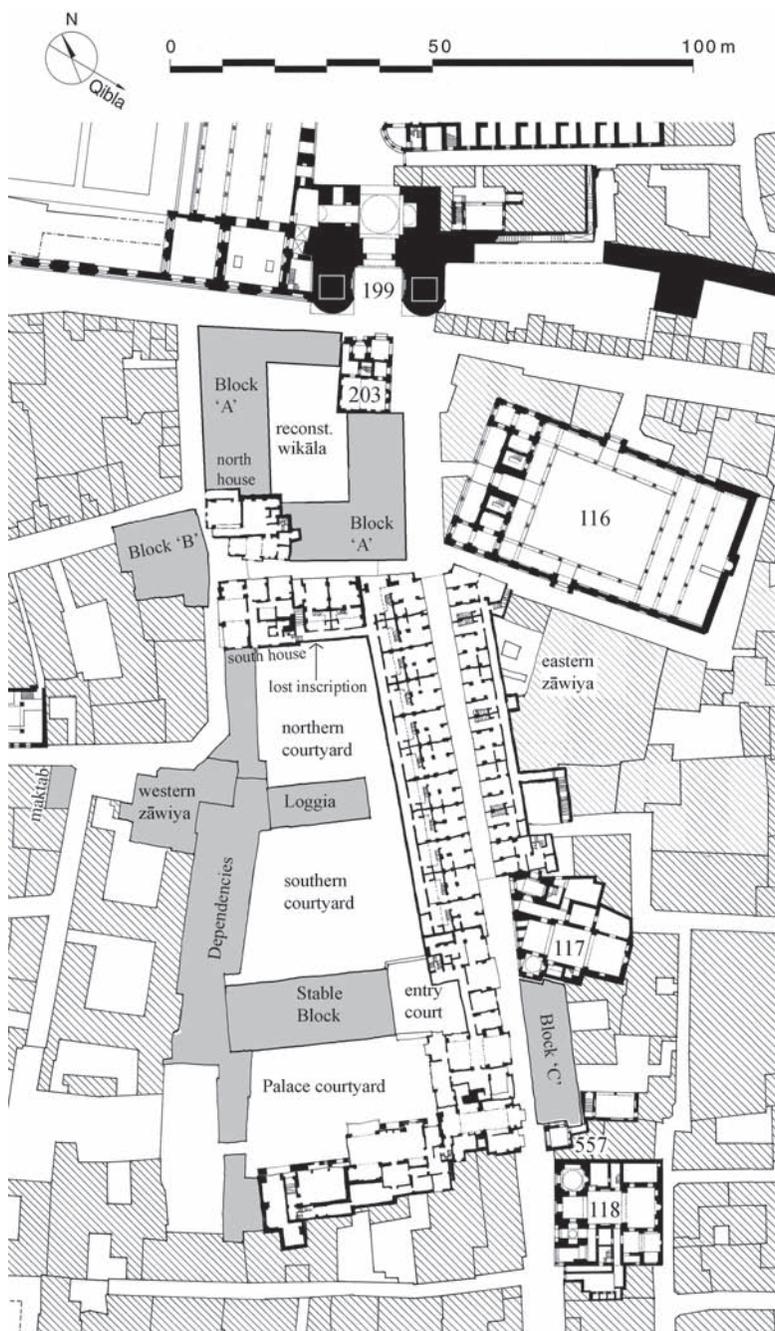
First floor sketch plan of complex of Riḍwān Bey (unsurveyed sections in grey). Author's drawing.
